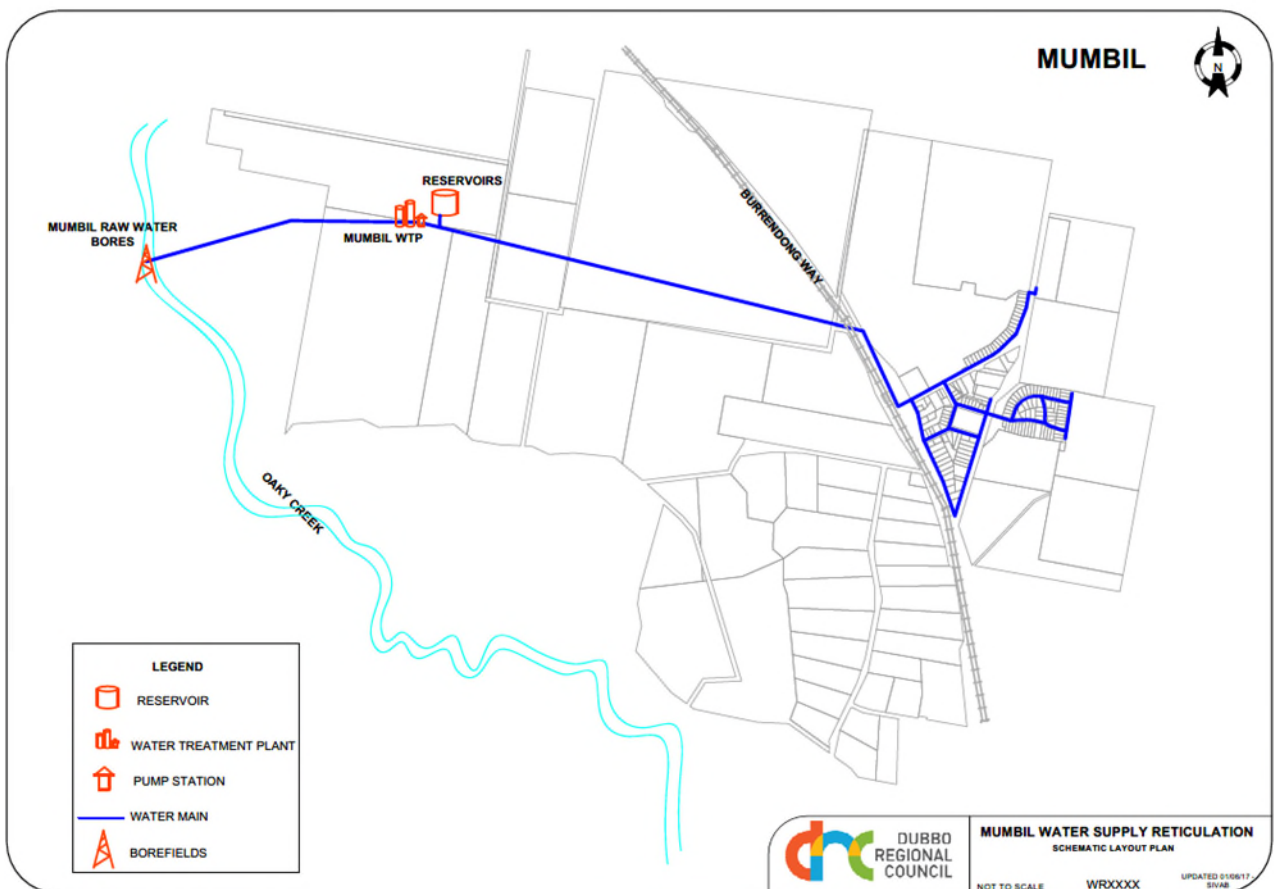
Mumbil Water Supply Reticulation Schematic Layout Plan
